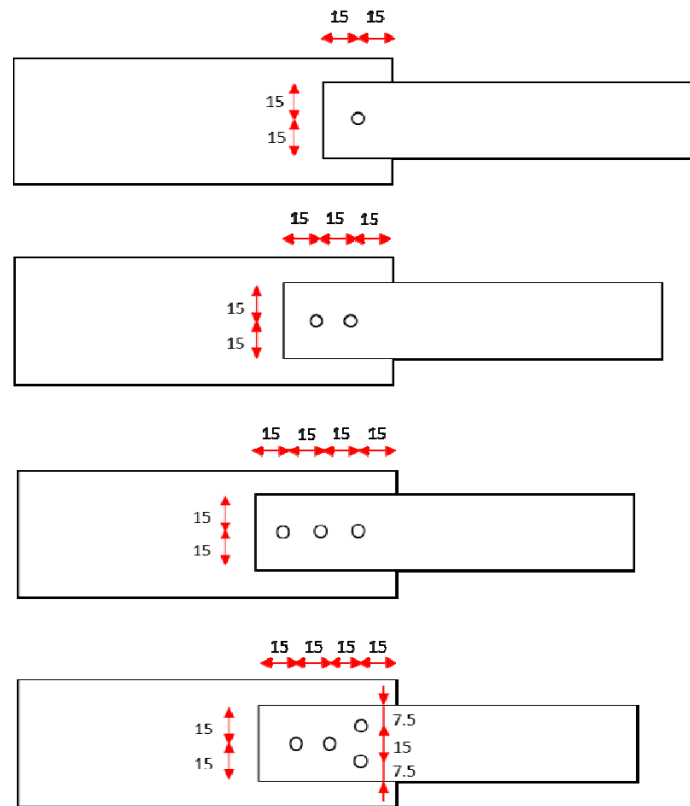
Screw Arrangements for Solid Type 2 Strap (All Dimensions are in mm)
